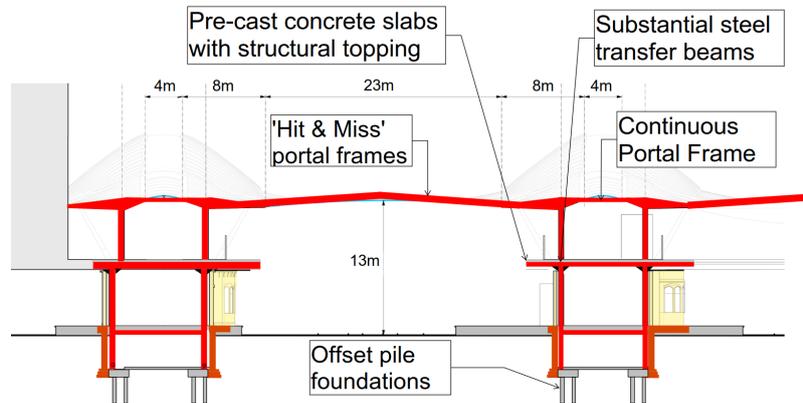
Option 2: 'Reuse existing masonry with new portal frames above 1st floor'
